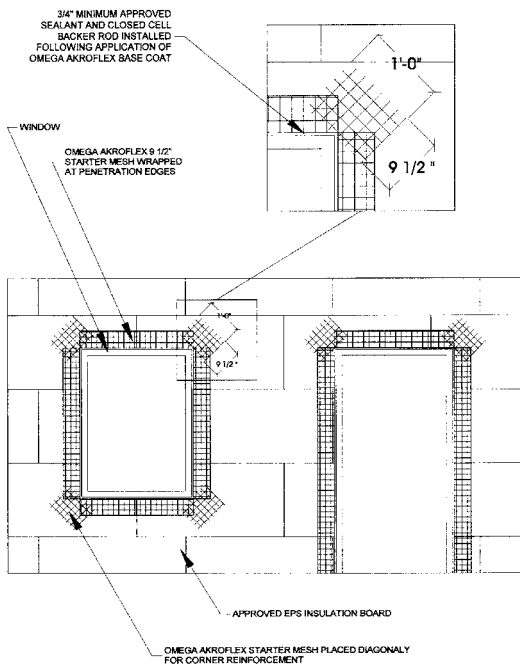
TYPICAL INSTALLATION DETAILS OF EIFS WITH DRAINAGE
